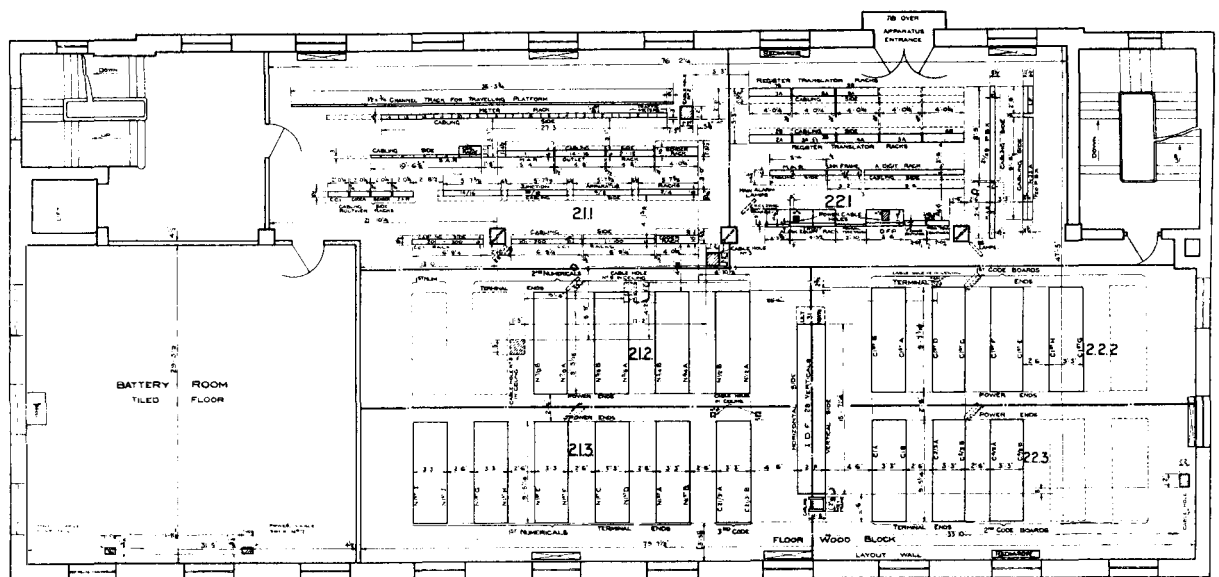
AUTOMATIC SWITCHROOM, SECOND FLOOR.
